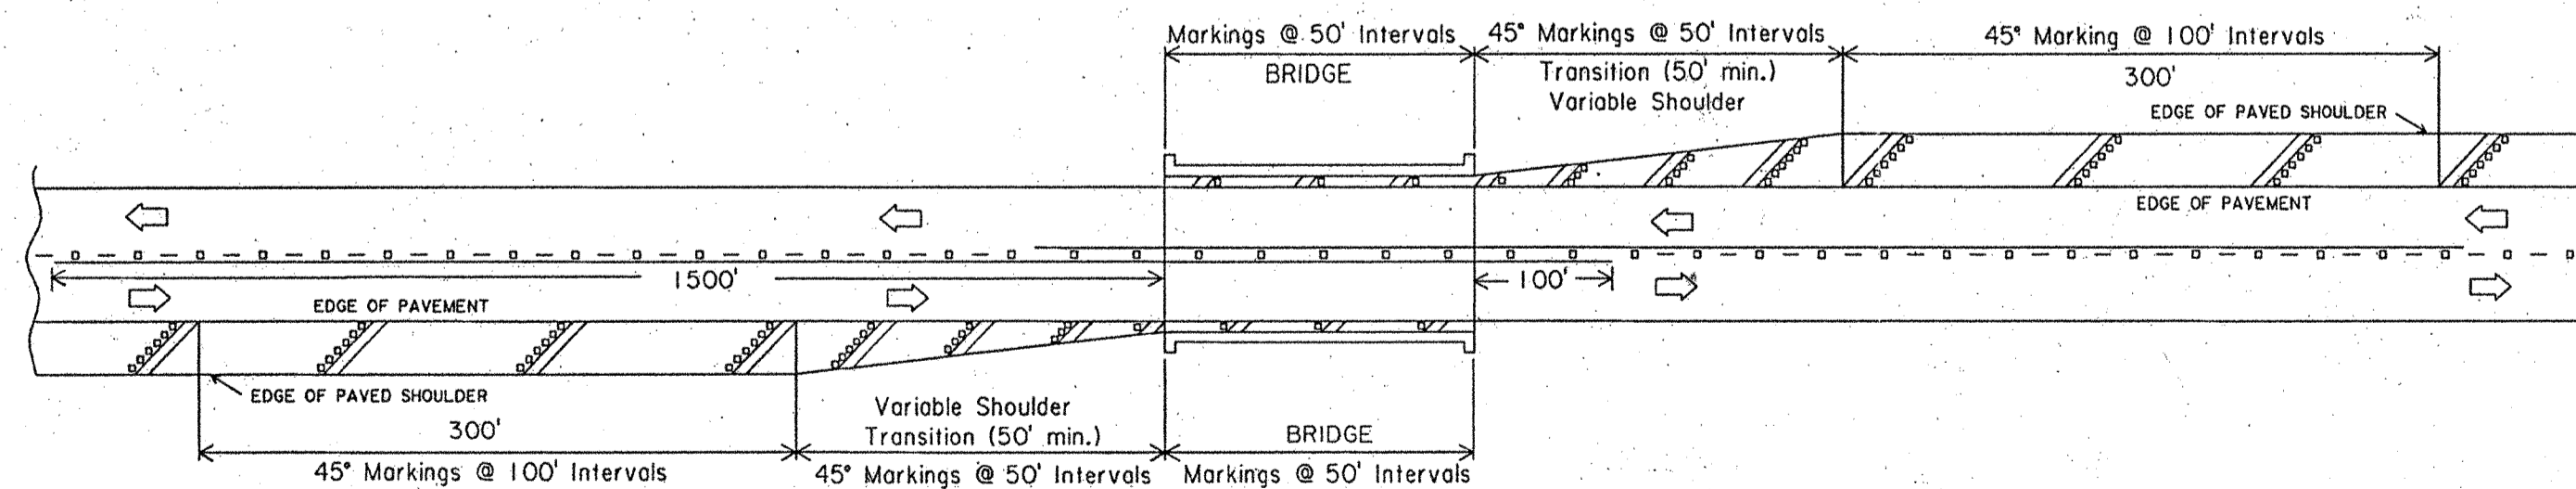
DETAIL OF OUTSIDE SHOULDER MARKINGS IN ADVANCE OF AND ON NARROW BRIDGES
